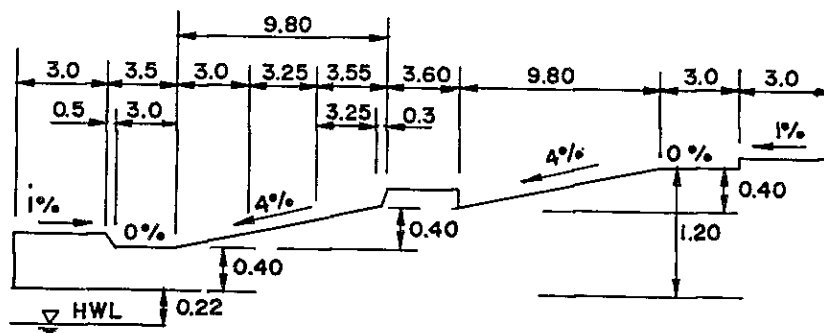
CROSS SECTION OF MINOR BRIDGE
